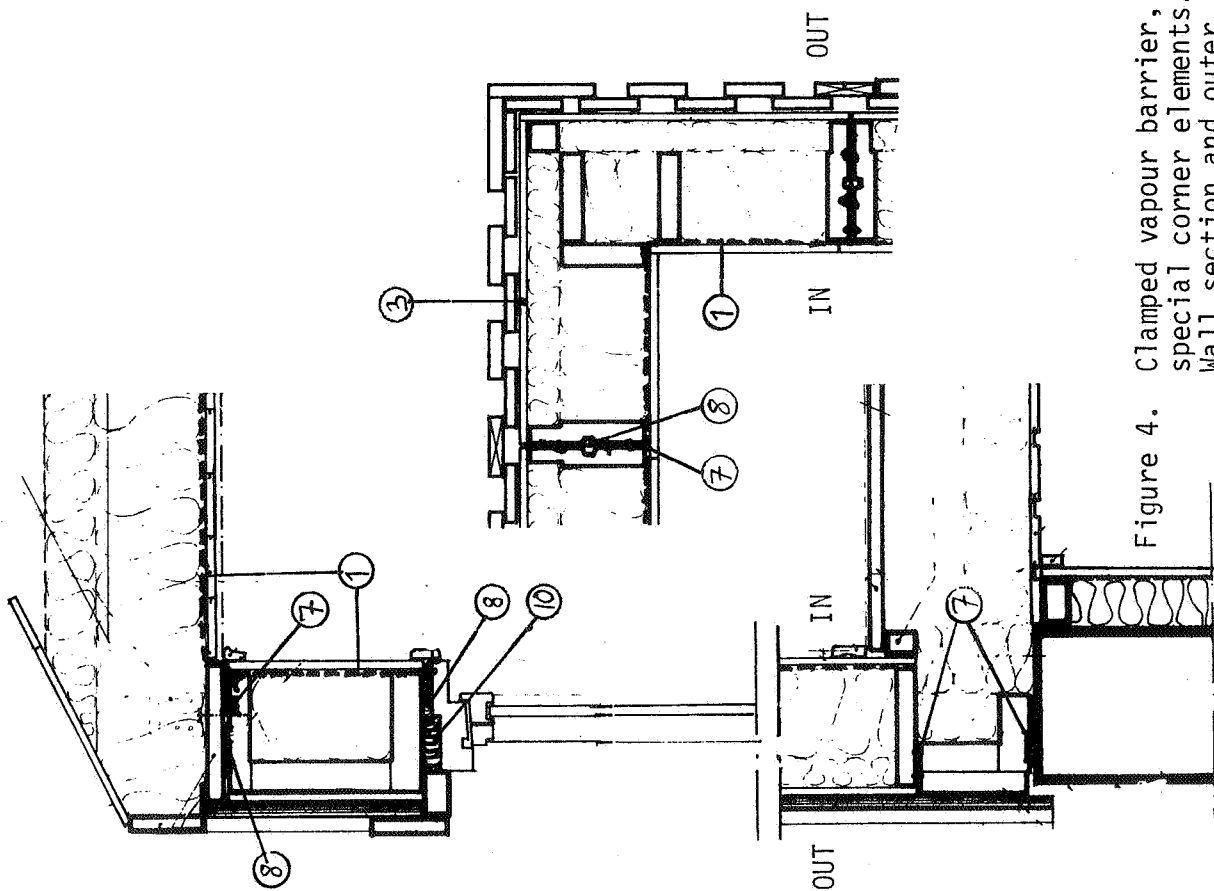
Clamped vapour barrier, special corner elements. Wall section and outer corner
